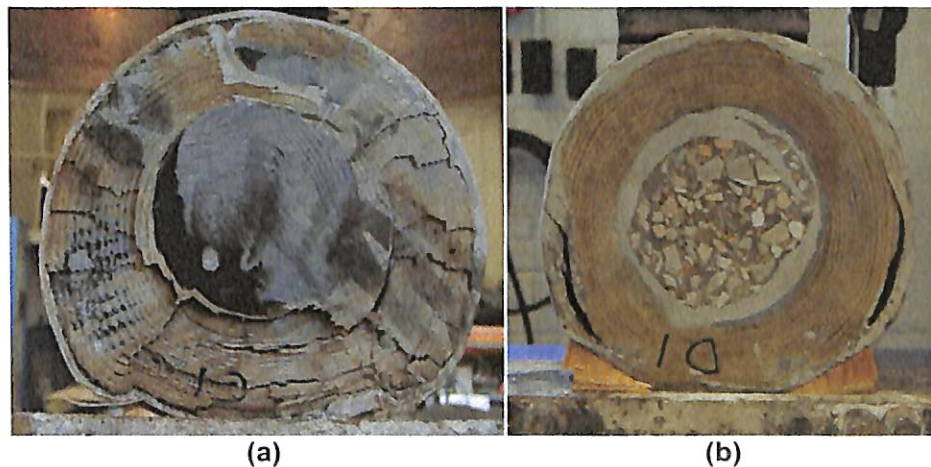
Bond Failure: (a) Bond Slip of the Core; (b) Delamination of Fiberglass Reinforcement
